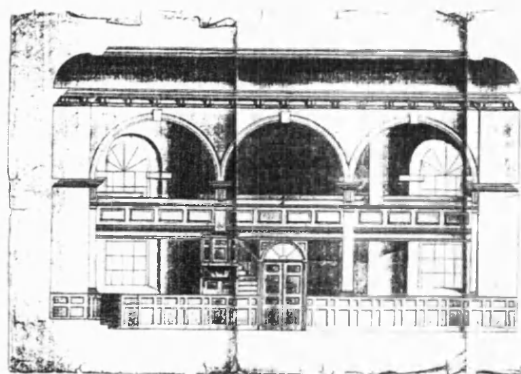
John Harvey's church 1734. Interior elevation of south wall. Biggs 5204.
